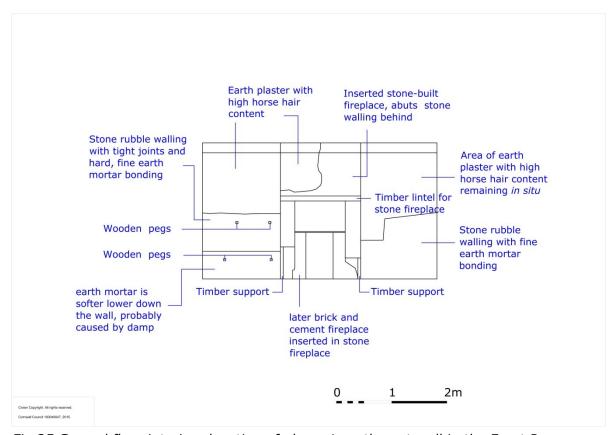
Ground floor interior elevation of phase 1 north-east wall in the Front Range.
